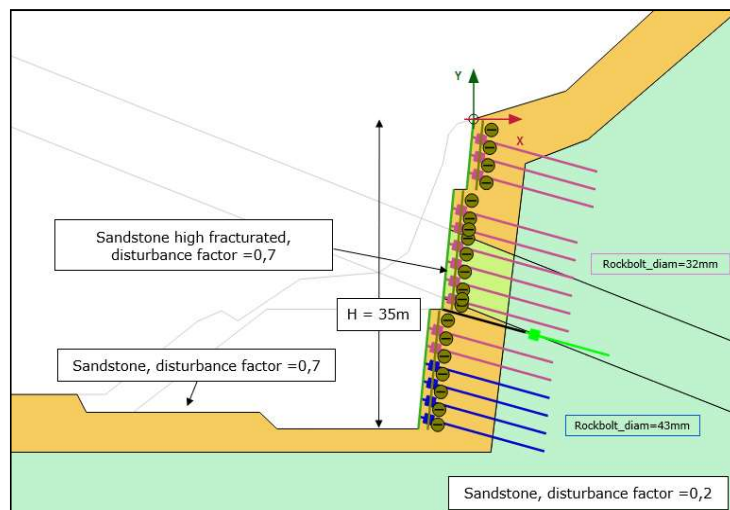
Plaxis 2D - Model Layout - South Section +45.58
